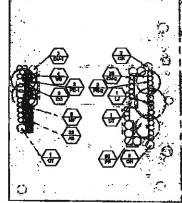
TOWNHOUSE COURTYARDS
